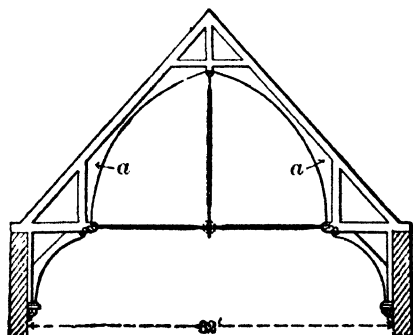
Hammer-beam Truss for Grace Chapel, New York City
